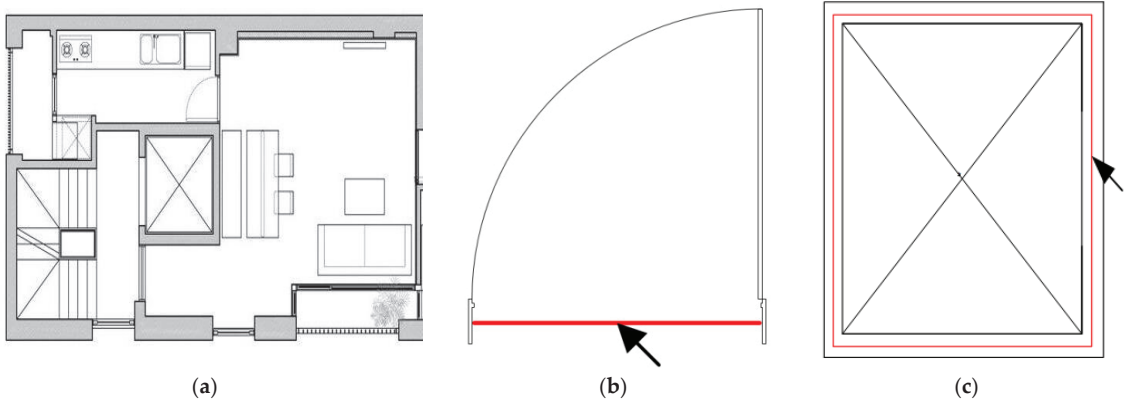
Examples of element geometry extraction. (a) original floor plan, (b) door geometry extraction, (c) vertical pathway geometry extraction.
